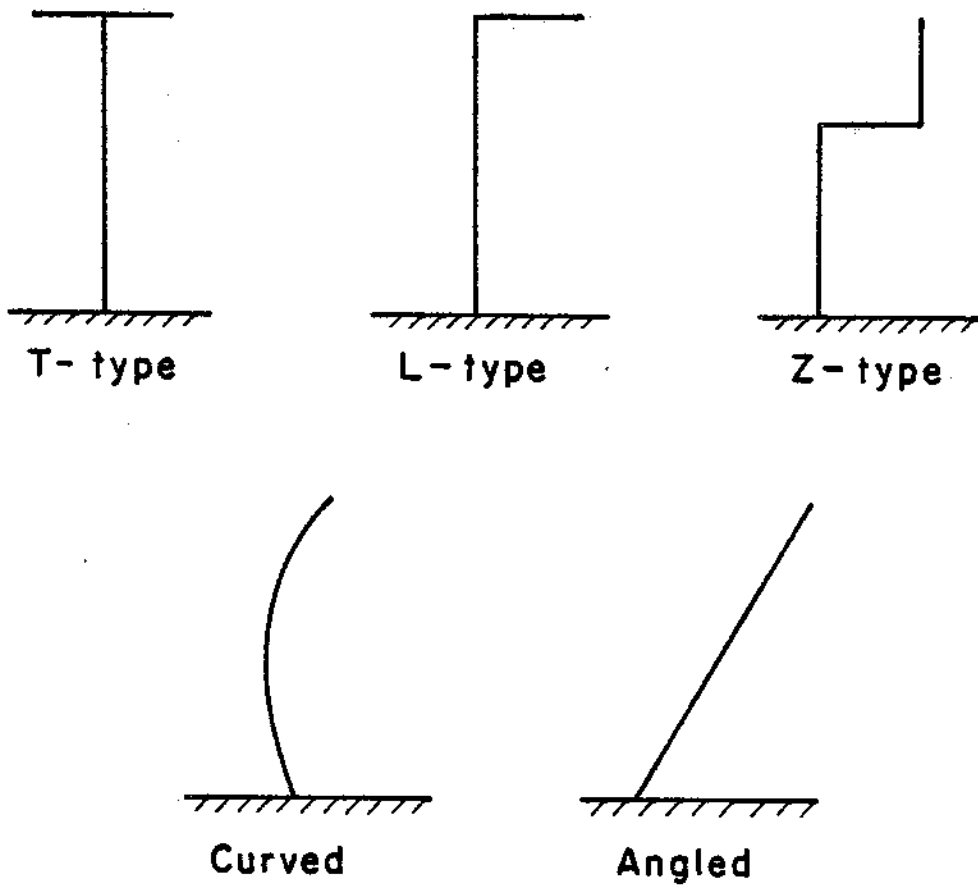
Groin Plan Forms (after Horikawa, 1978, p. 330)
